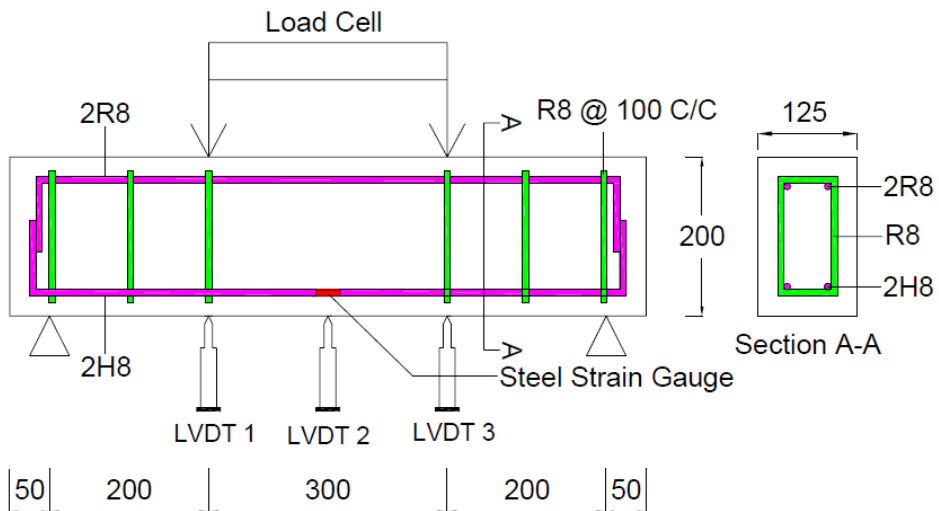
Detailing of NWRC-W/S Beam (Note: all dimension in mm)
